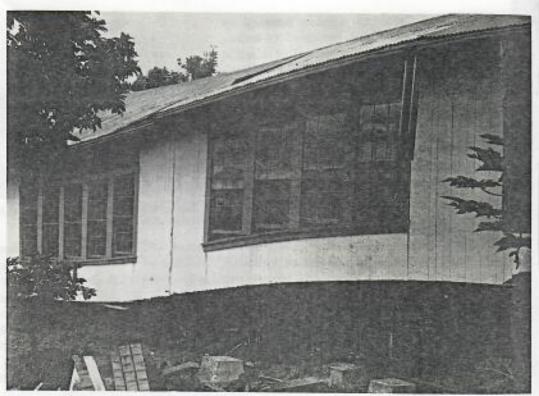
Central portion of Honaunau School, from the southwest. All but the south end of this building was let down and moved westward owing to inadequate bracing of the underpinning in an east-west direction transverse to the longer dimension of the building.
